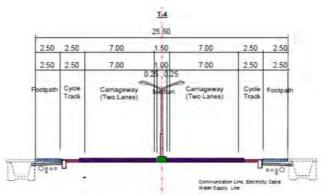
Proposed Typical Cross Section (Tertiary-4 Lanes)
